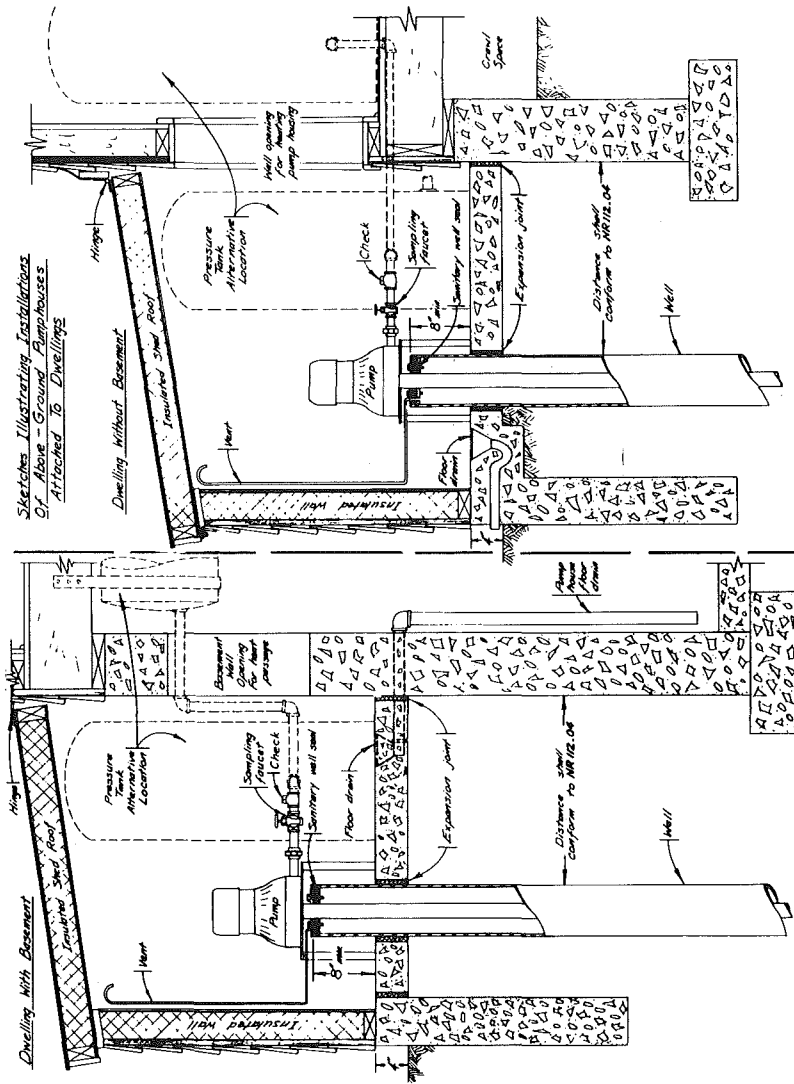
Insulated Pumphouse Adjoining a Dwelling.
